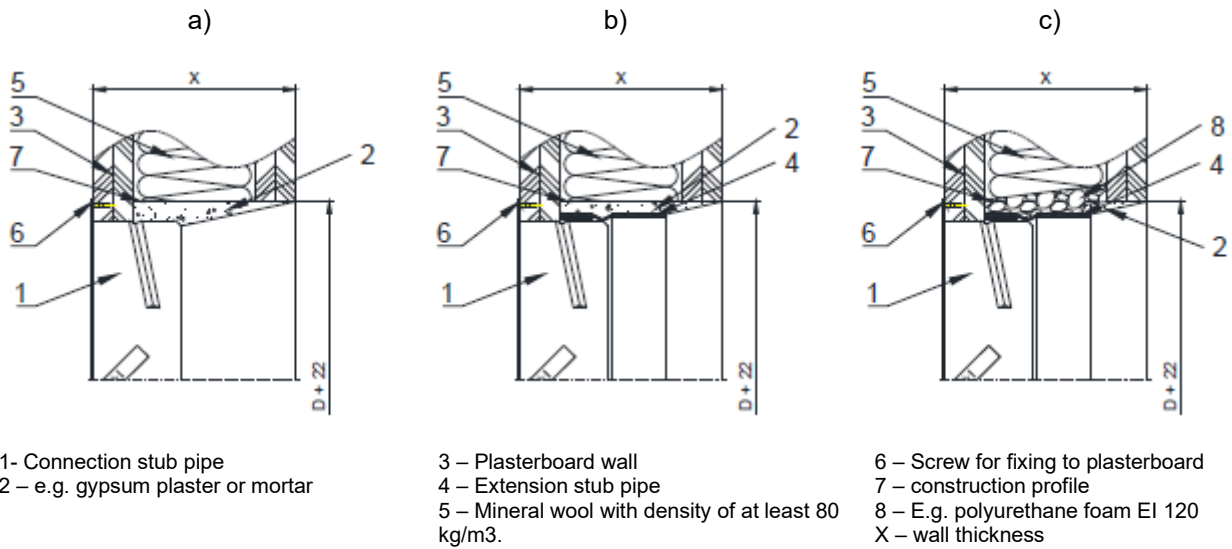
Sample setting of a connection stub pipe in a plasterboard wall
